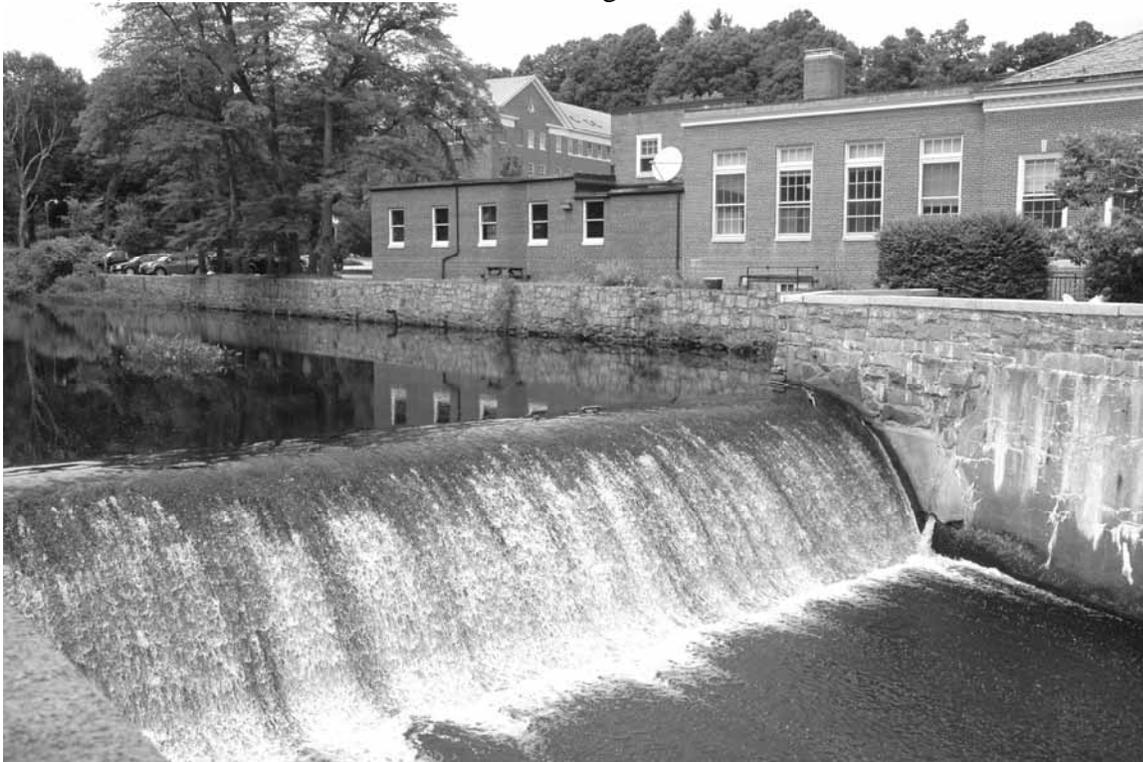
Grove Street Dam, west of Grove Street Bridge, with Post Office in background
